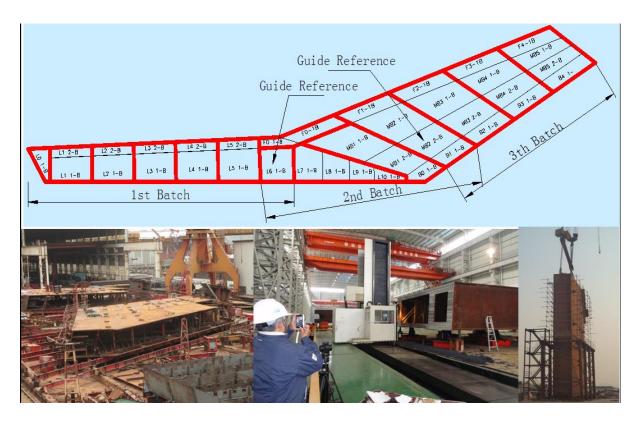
Above: Preassembly in batches, Below: Pylon legs fabrication, machining & trial assembly
